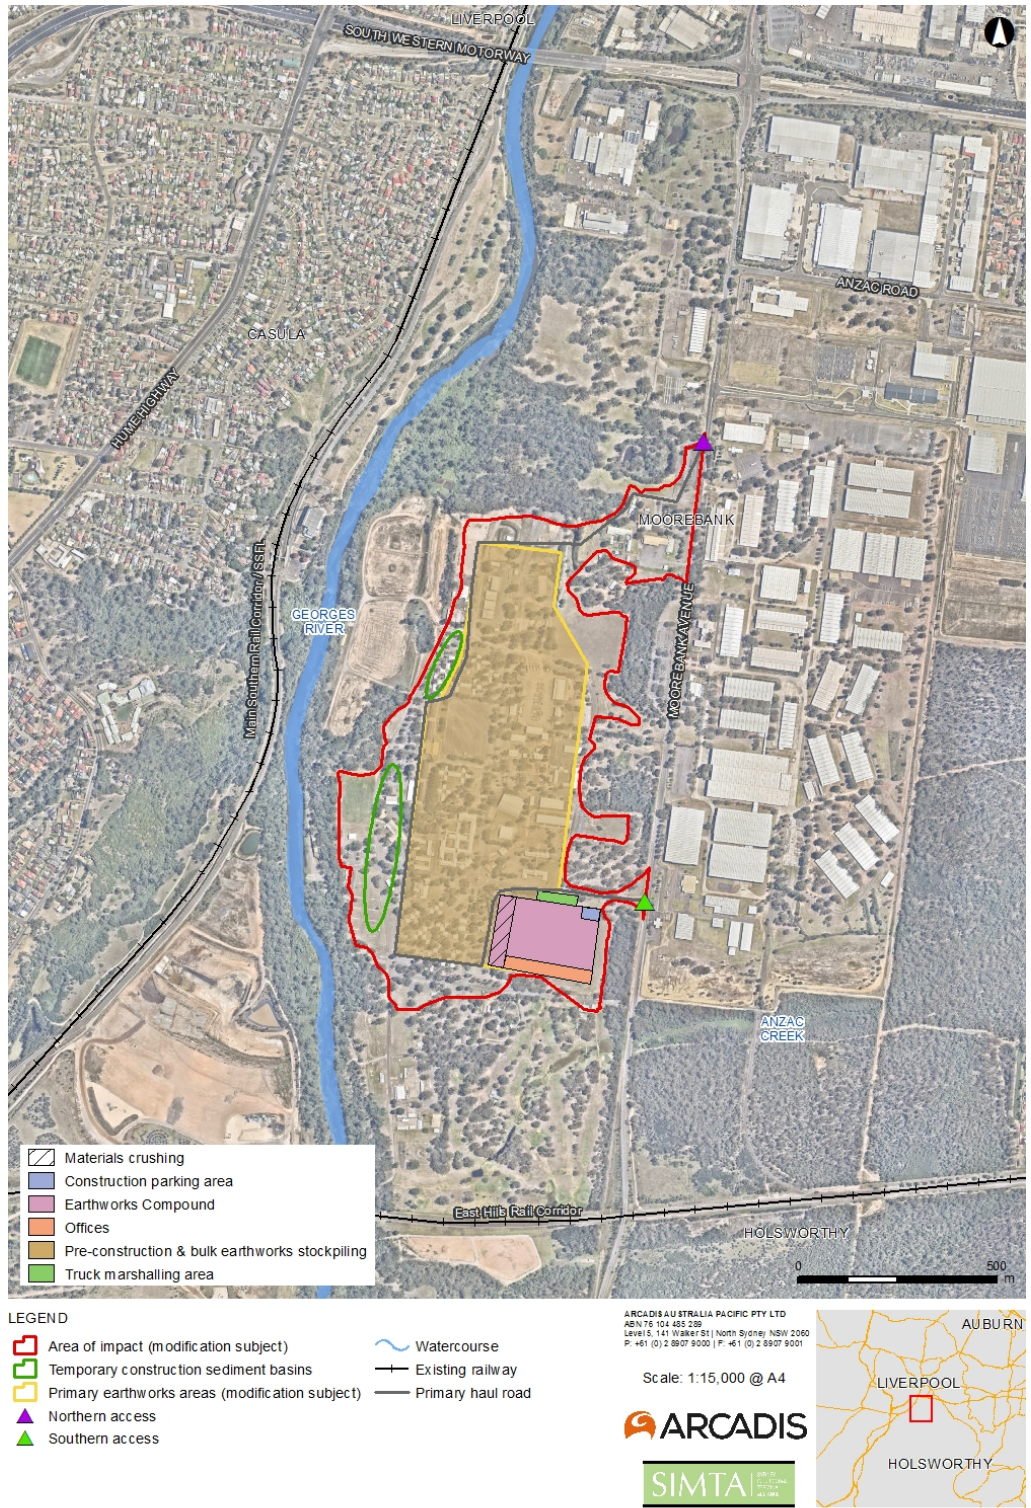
Proposed earthworks (MPW Concept Plan modification)
